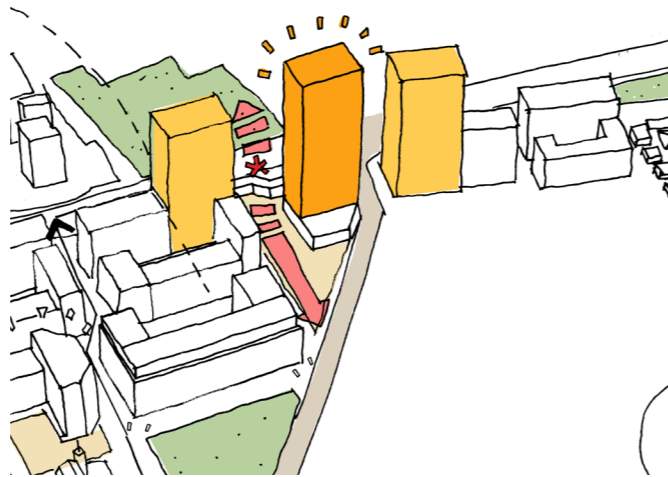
Illustrative sketch showing cluster of tall buildings marking proposed public space and connection to the west of the A12
